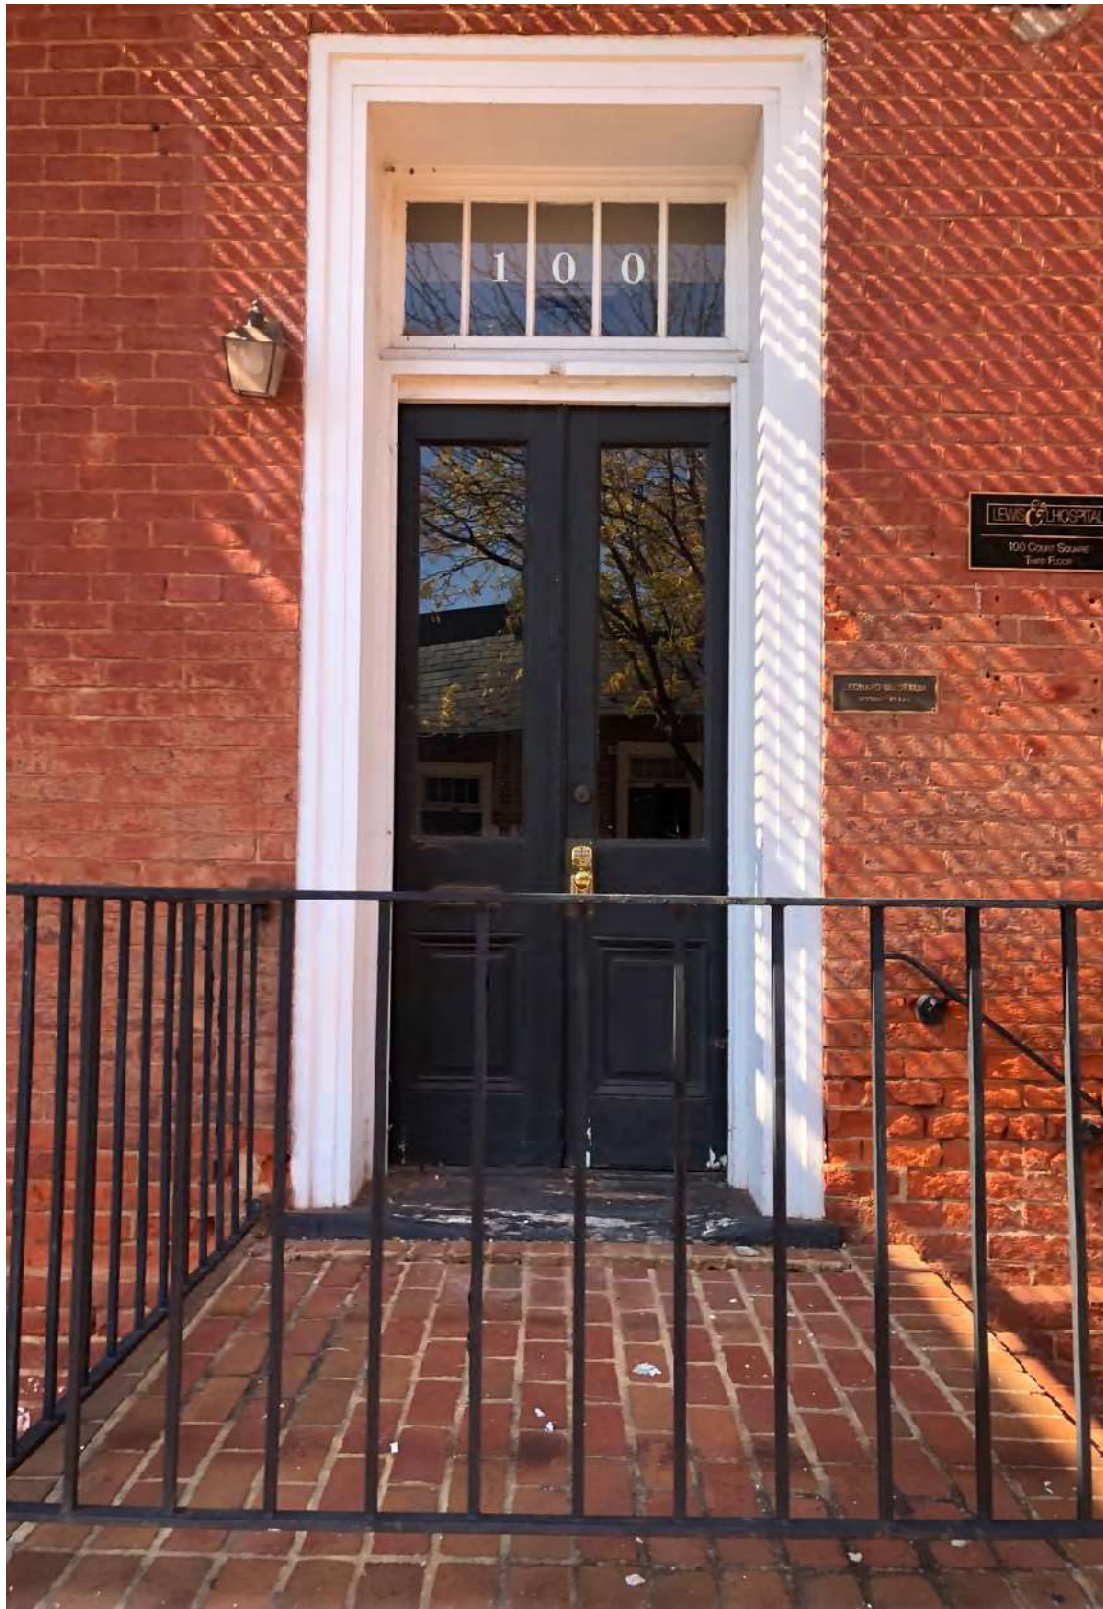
NON FUNCTIONING DOUBLE DOORS TO BE REPLACED WITH 15 LIGHT DOOR TO MATCH WINDOWS
